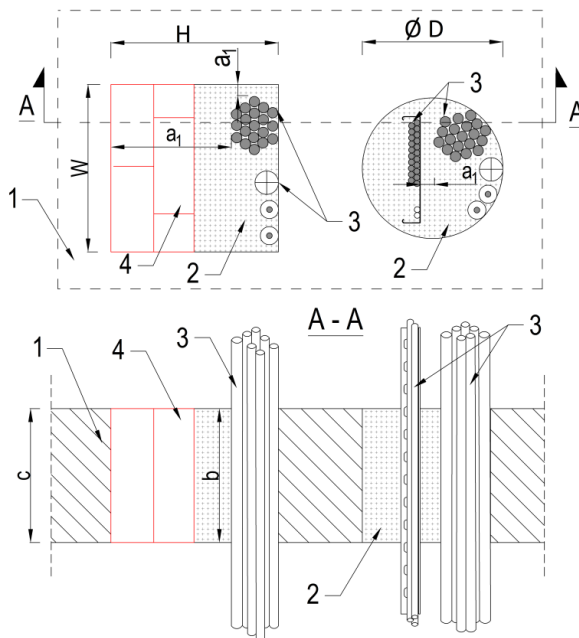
Cable penetration seal in the floor - detail with increased floor thickness
